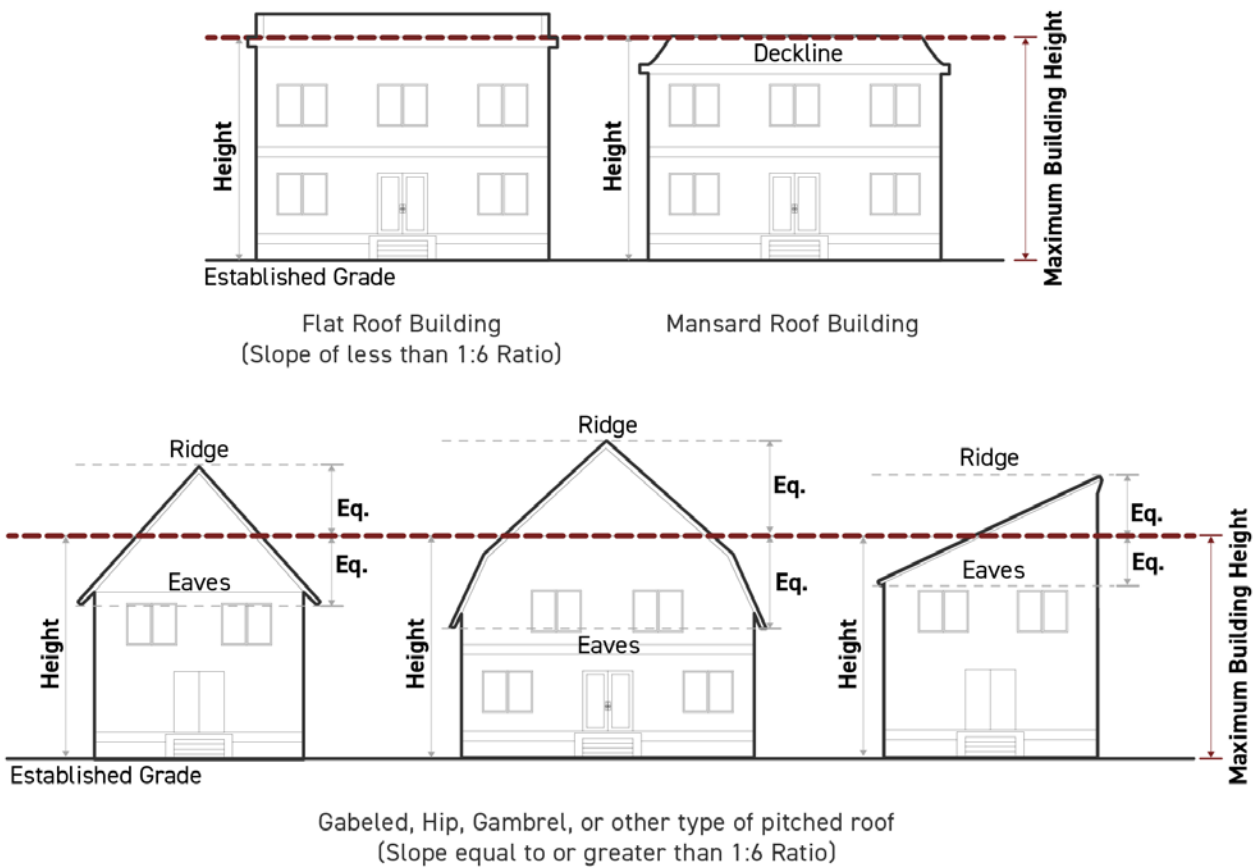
Section 112 – Building or Structure Height ~~of less than 5 Storeys~~
